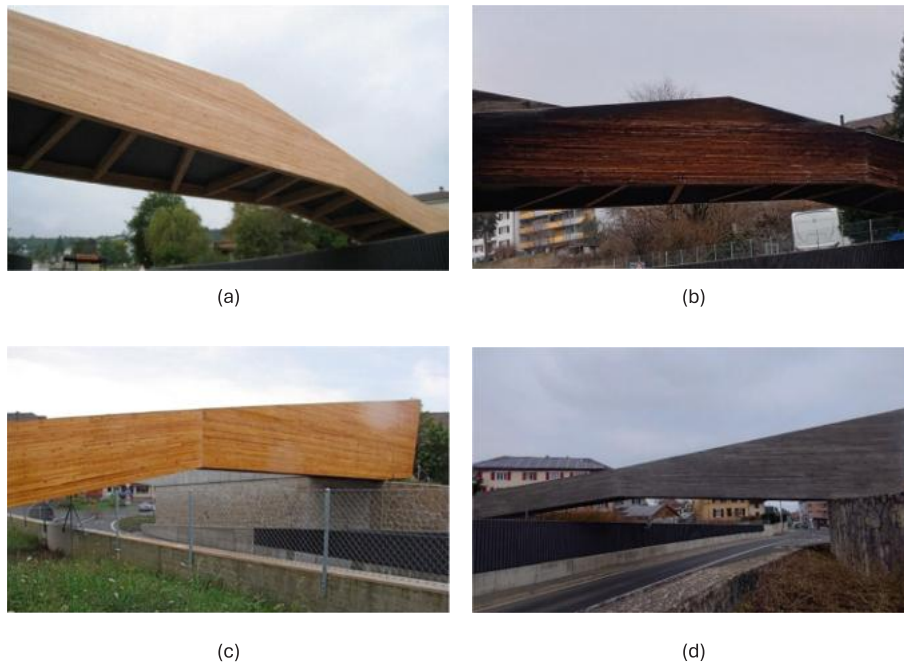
Corcelles\_2008 Bridge – West facade: (a) as new and (b) in 2025; East facade: (c) as new and (d) in 2025.
